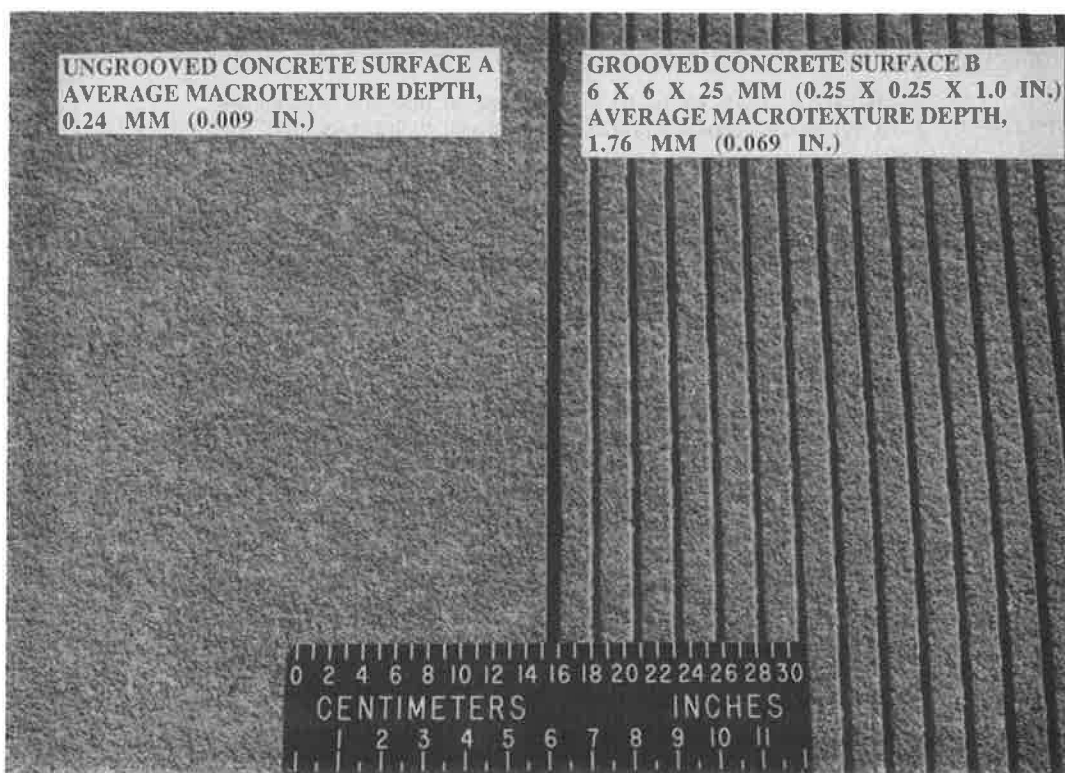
Concrete test surfaces at NASA Wallops Flight Facility.
